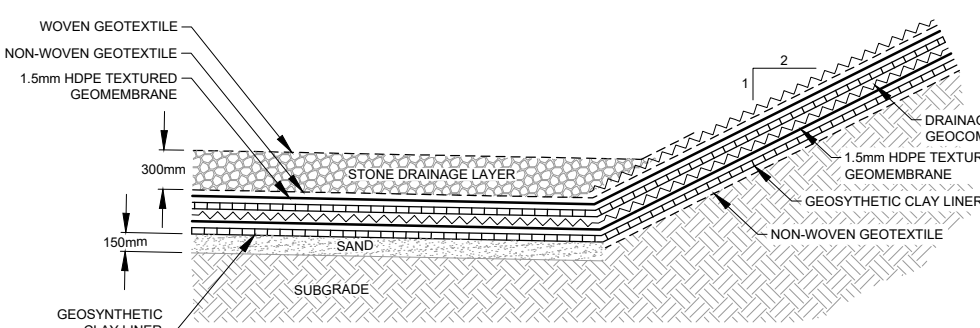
BASE LINER AND LEAK DETECTION SYSTEM
